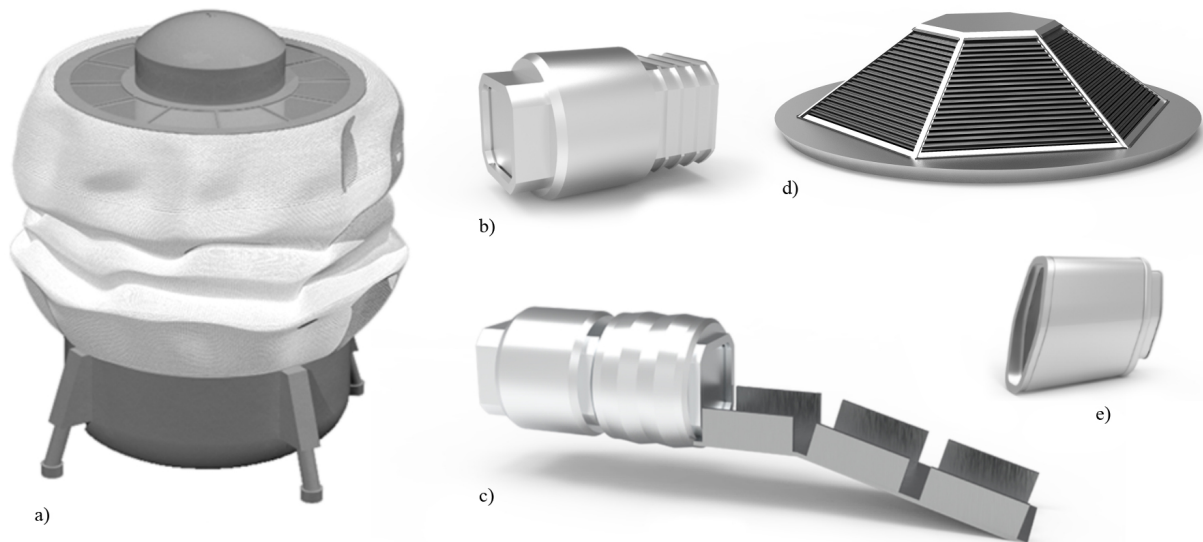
Prefabricated surface elements: a) Deployable inner module; b) Airlock; c) Suitlock; d) Skydome; e) Window
